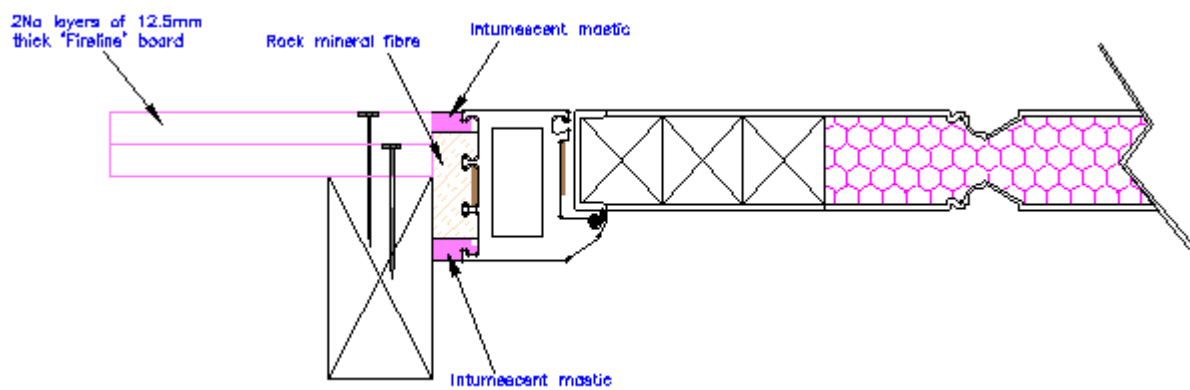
Details of Supporting Construction to Frame, Fire Stopping
